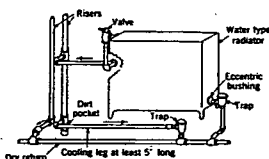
TOP AND BOTTOM OPPOSITE END RADIATOR CONNECTIONS
